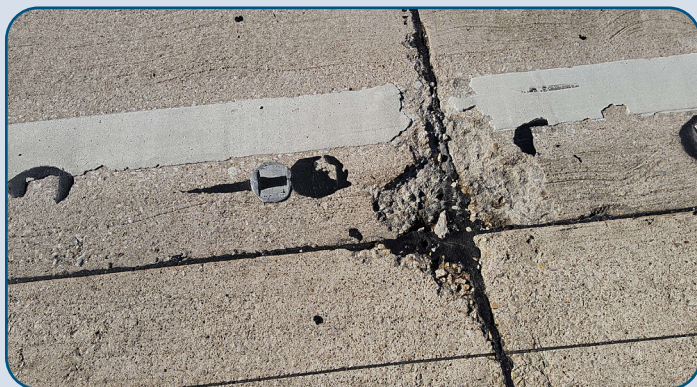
MCLB Pavement Spalling on the East End.
